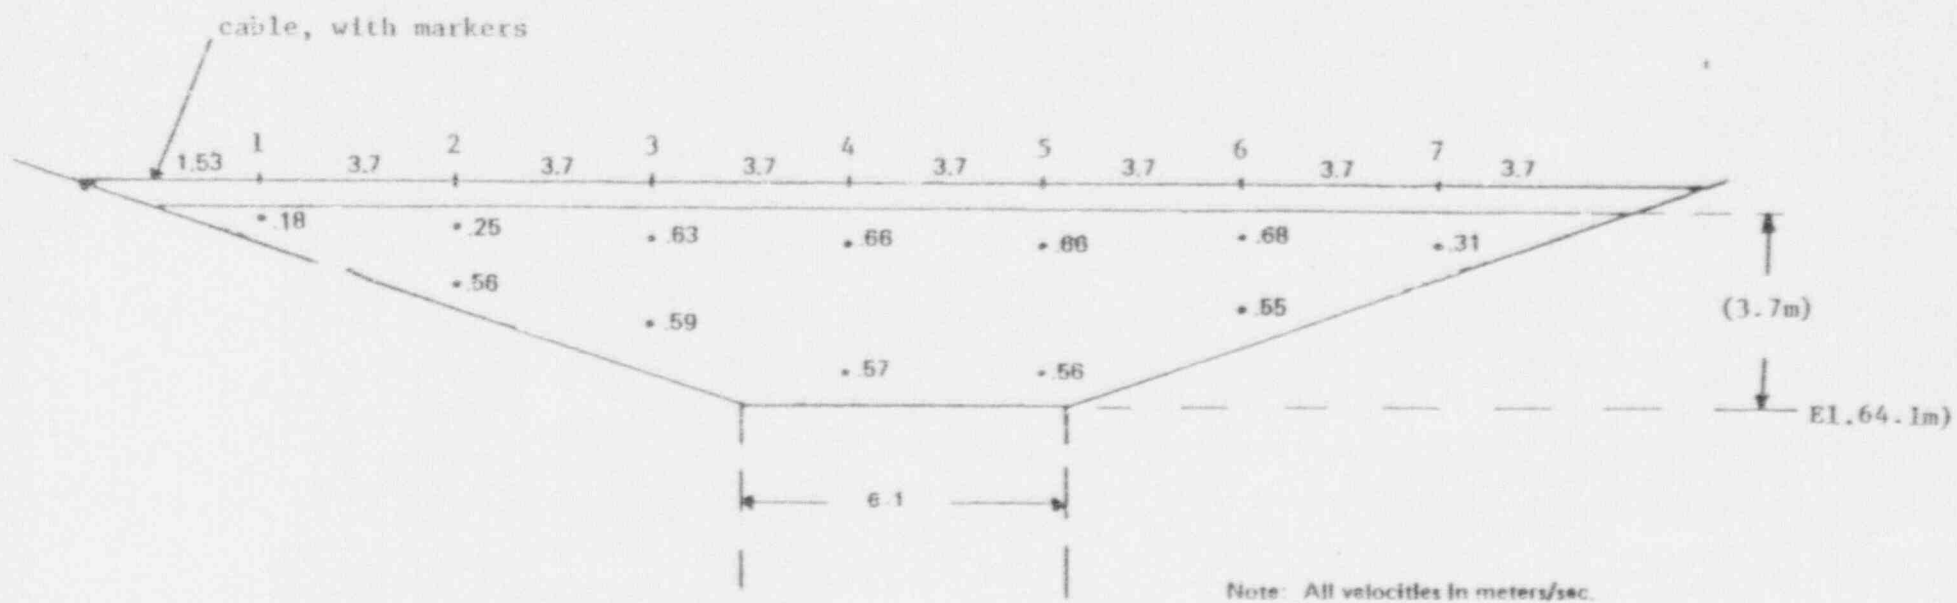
Approximate discharge canal cross section at test site (looking upstream)
